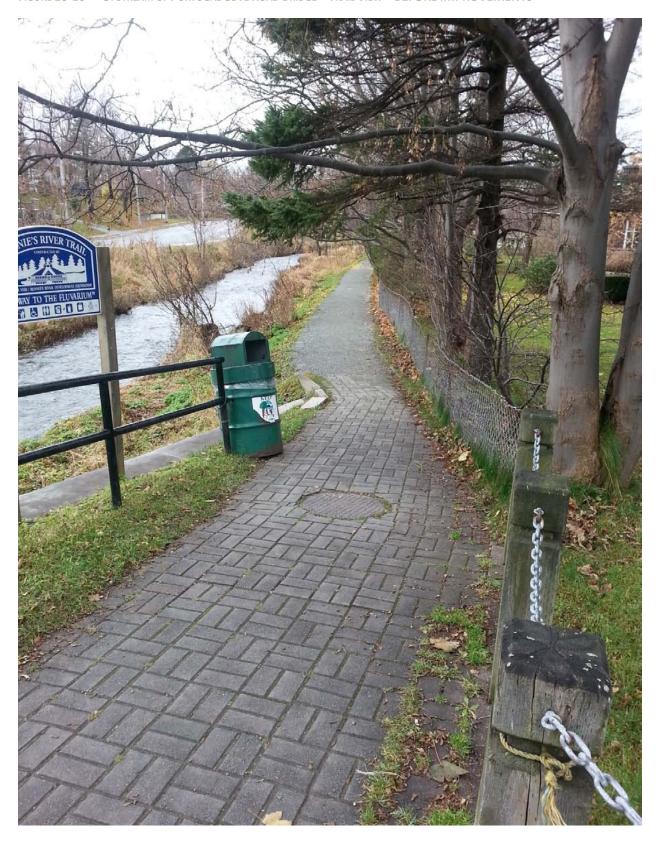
UPSTREAM OF PORTUGAL COVE ROAD BRIDGE - TRAIL VIEW - AFTER IMPROVEMENTS
